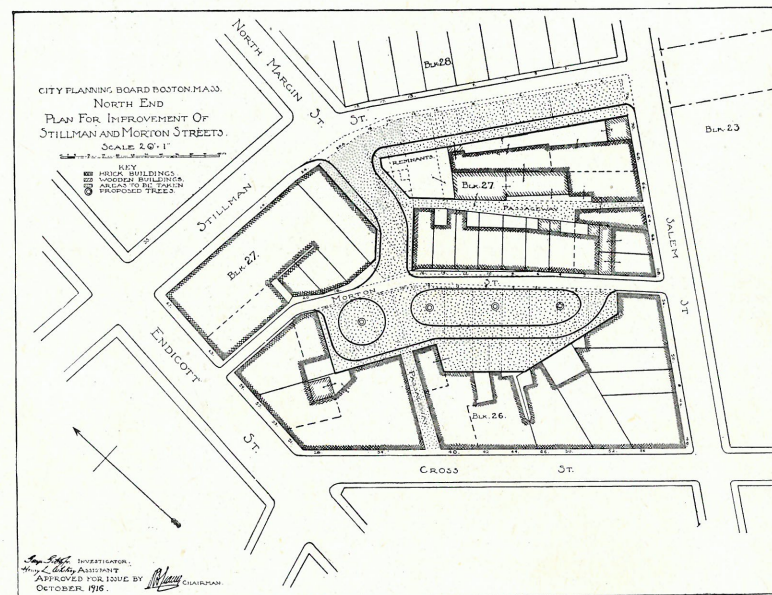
PLAN FOR IMPROVEMENT OF MORTON AND STILLMAN STREETS, AND EXTENSION OF NORTH MARGIN STREET, IN A WAY TO LEAVE EVERY LOT WITH SUITABLE FRONTAGE, AND NO LOTS OF EXCESSIVE DEPTH OR EXTREME SHALLOWNESS.
